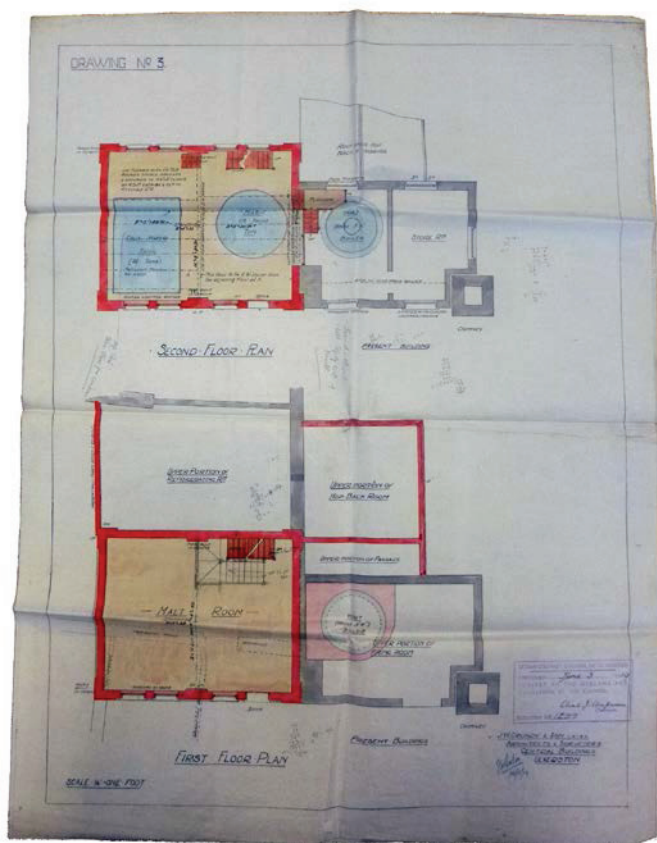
(left): Drawing number 3: first and second floor plans; proposed additions to Old Brewery, 1919
